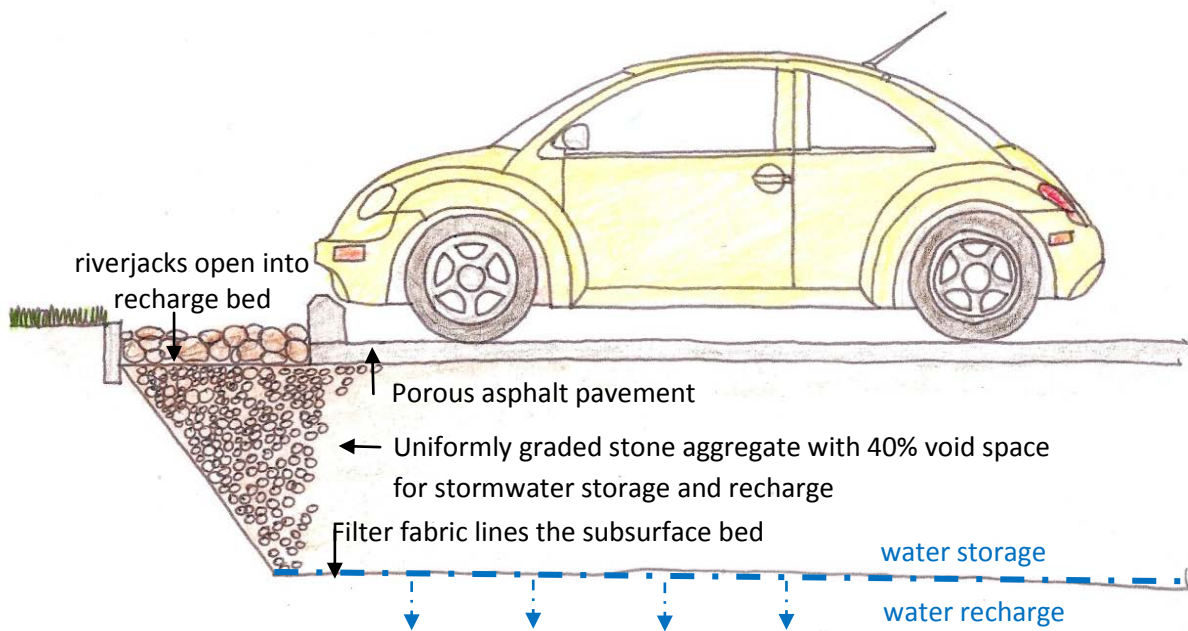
Cross-section illustrating the pervious parking pavement (The design guideline for porous asphalt with subsurface infiltration)
